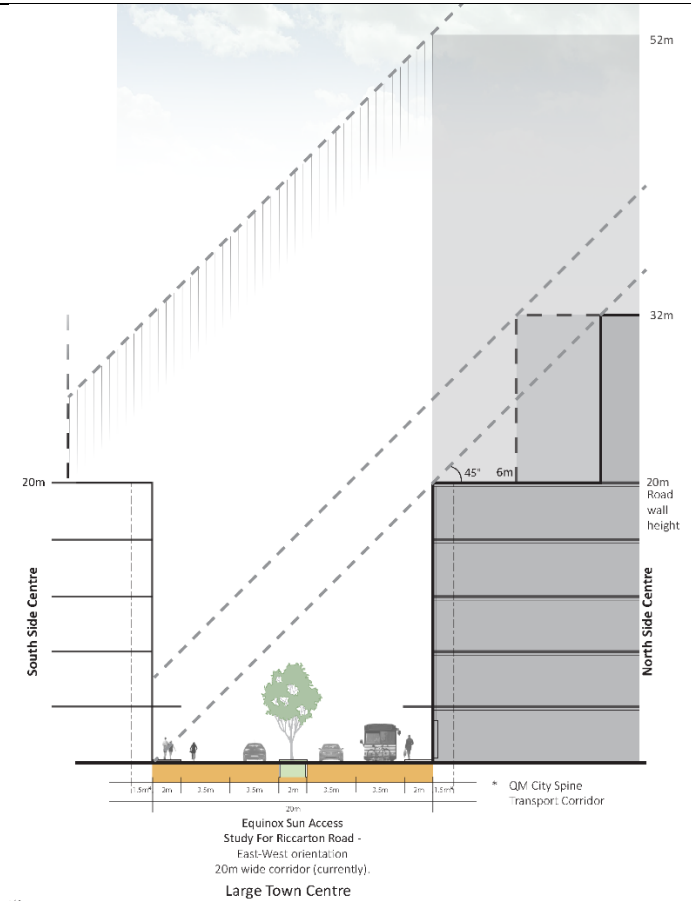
cross section of Riccarton Road (east west) illustrating the added shading at the Equinox between a 6m upper level setback and a 45-degree setback and the council recommended height of 32-metres. Also illustrated is KO's 52metre recommendation.
